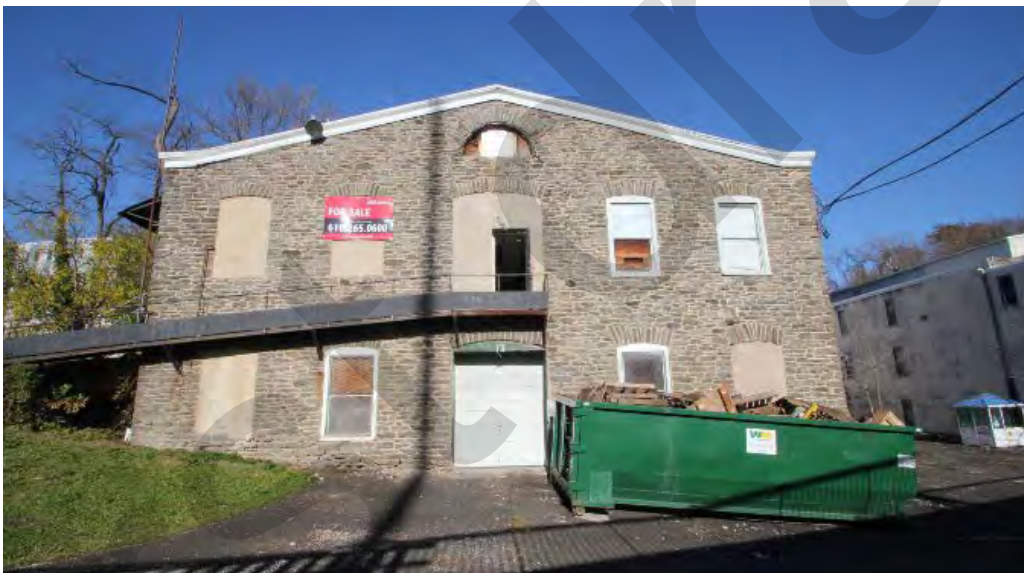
(top): South and east elevations of Mill #2, looking northwest.
